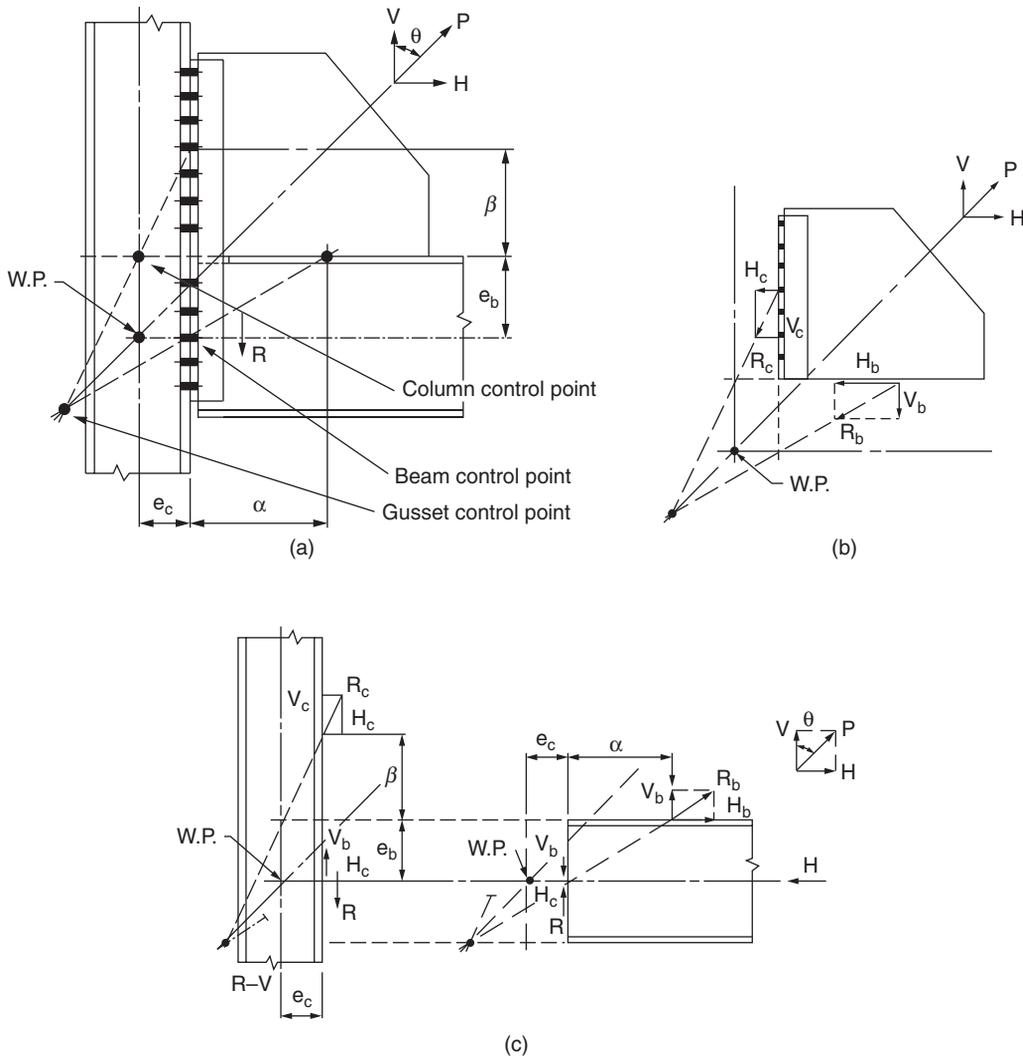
The uniform force method. (a) Geometry including control points. (b) Forces acting on the gusset. (c) Forces acting on the beam and column.
